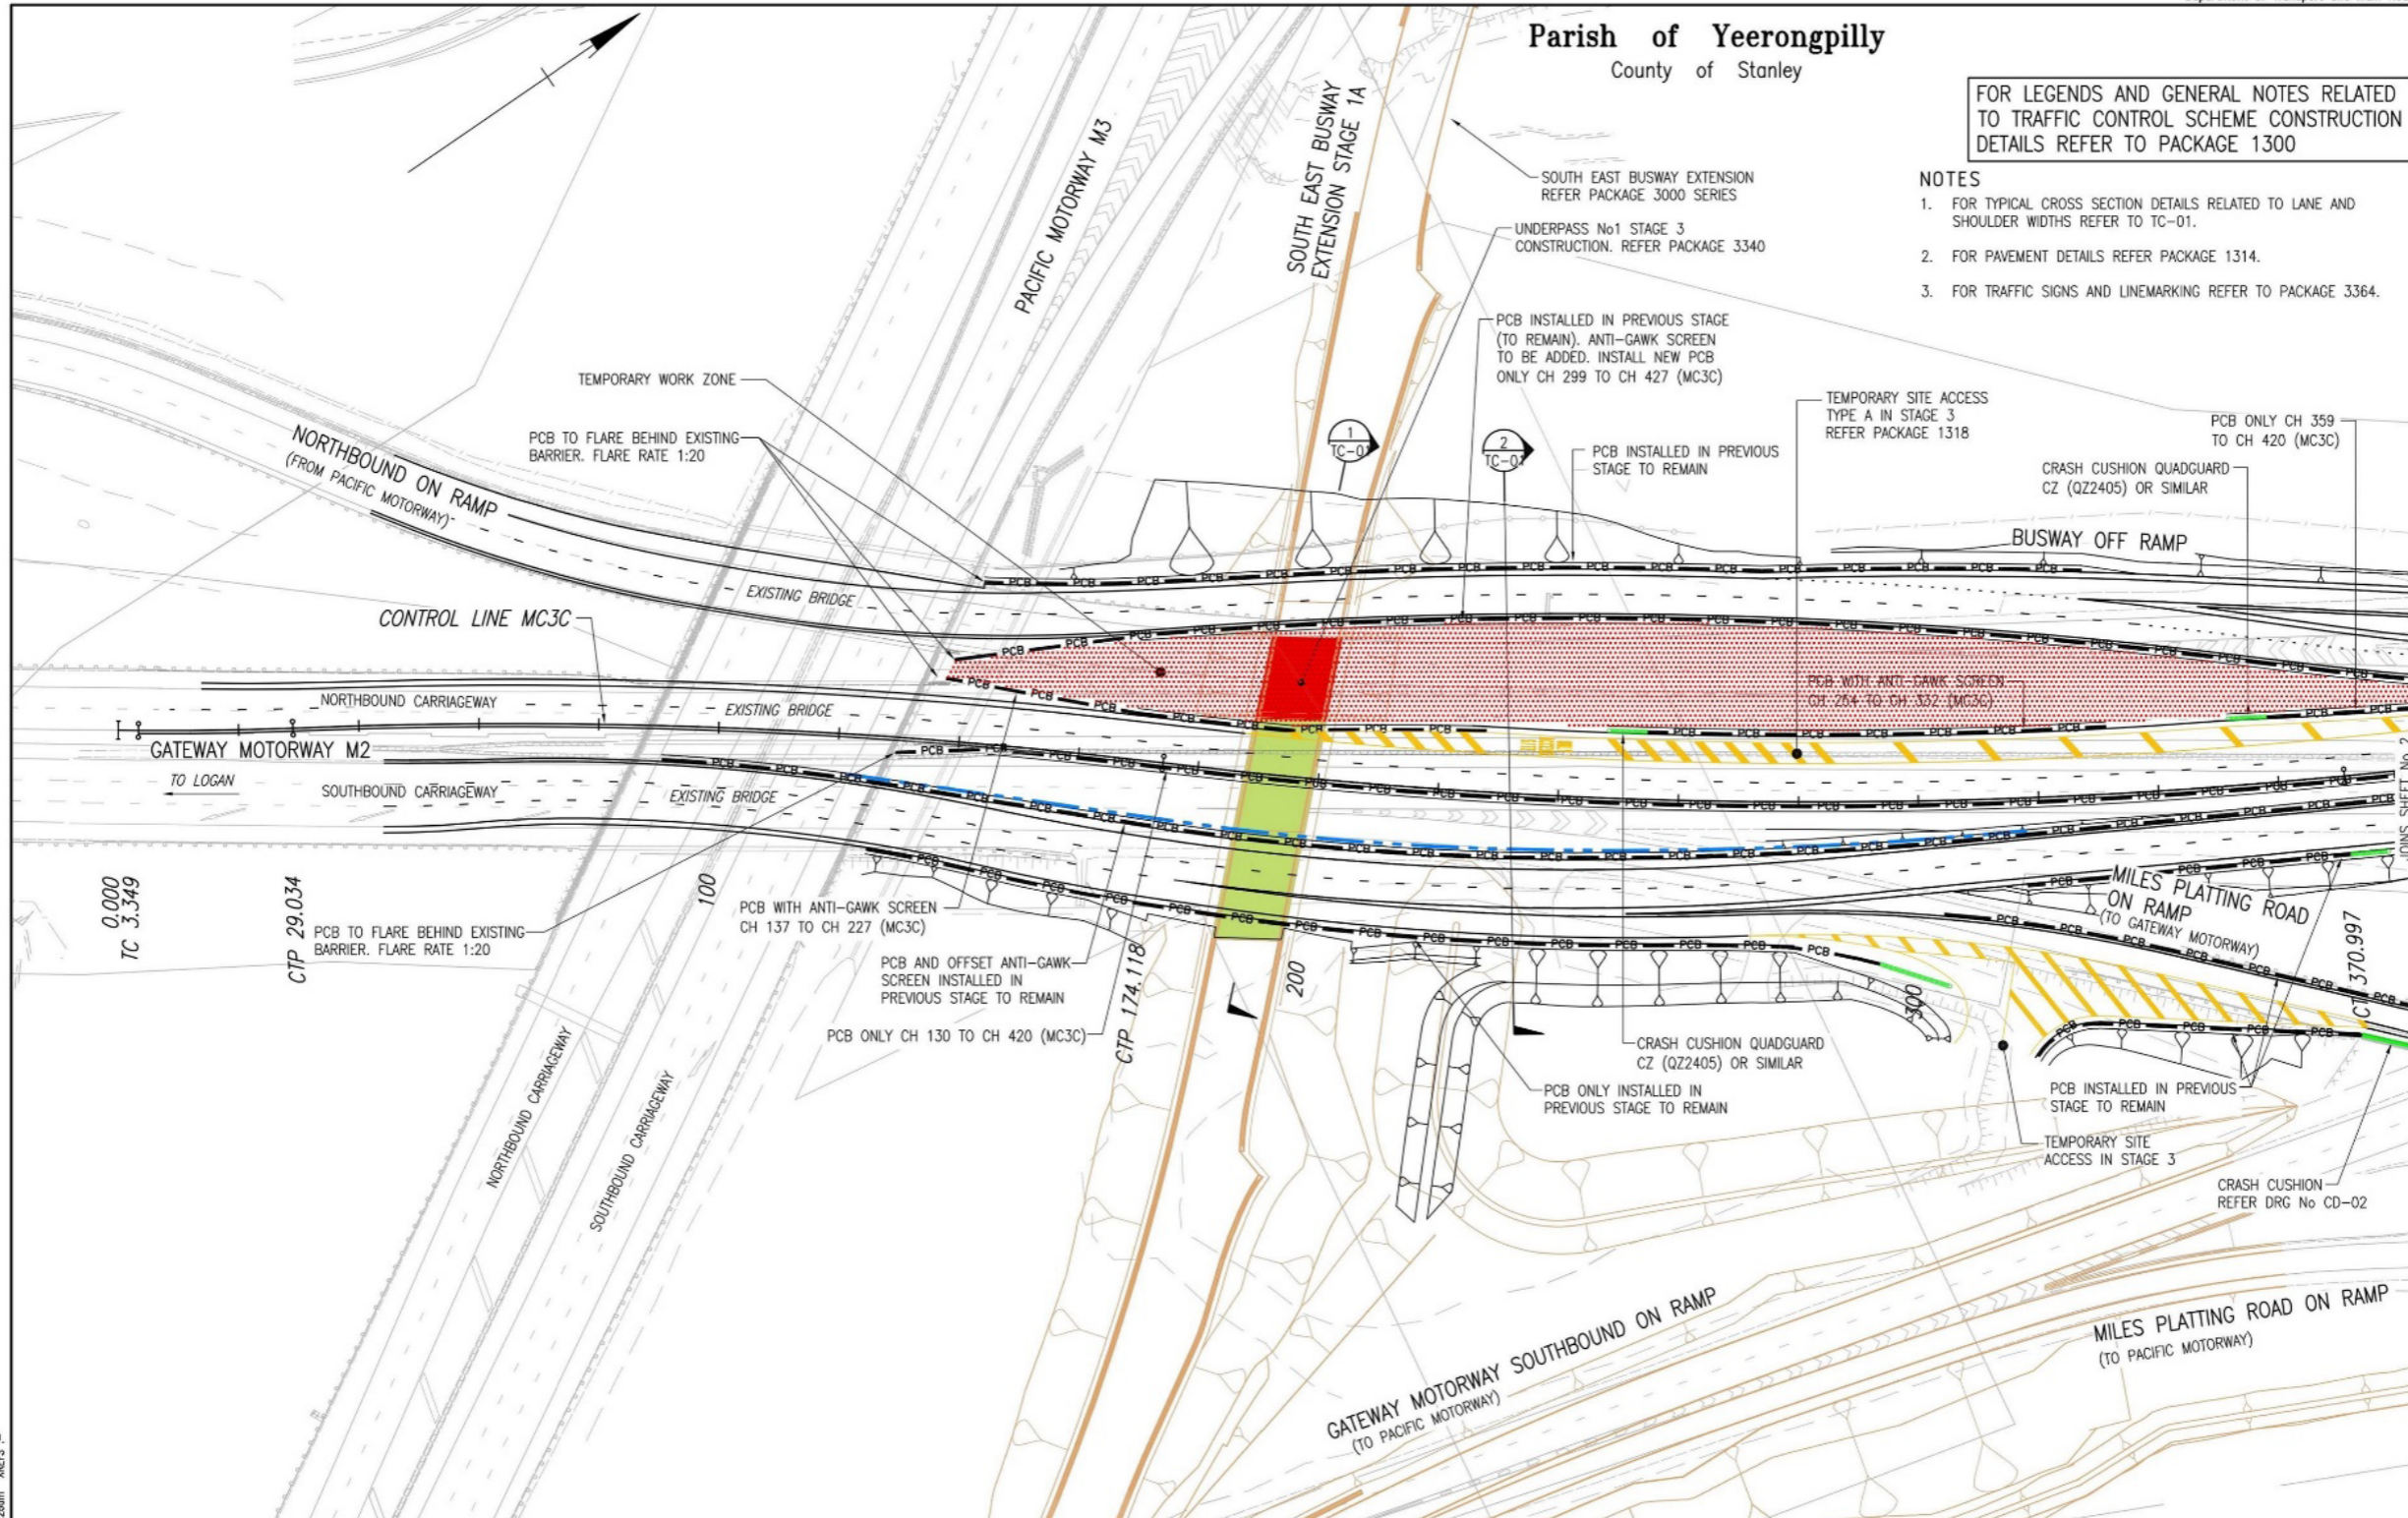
(e) – Construction staging – generic example 3 – sheet 1 of 2
